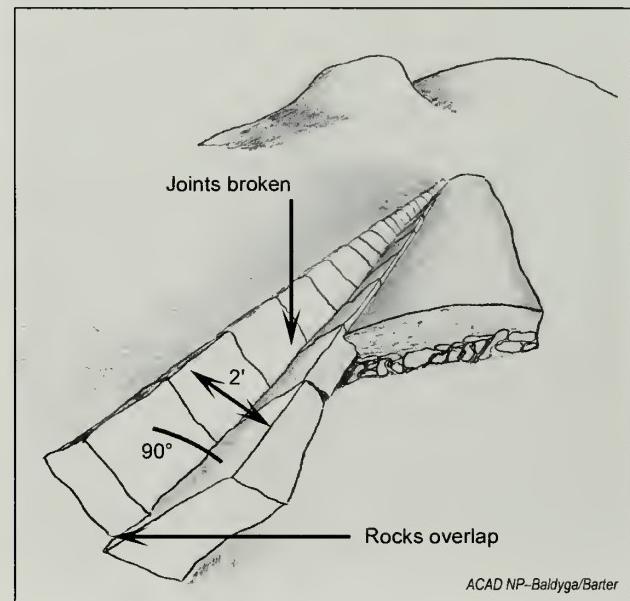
Detail of a fully constructed "V-shaped" side drain.
